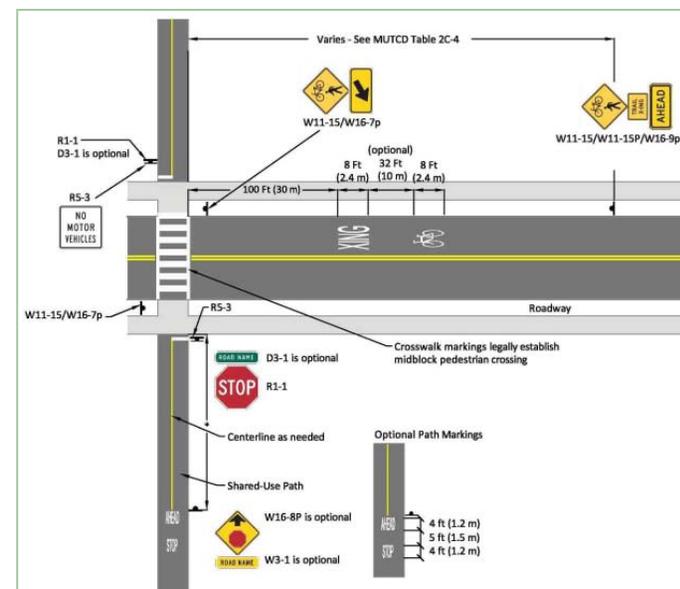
Intersection Designs and Signage for Trail/Road Intersections
